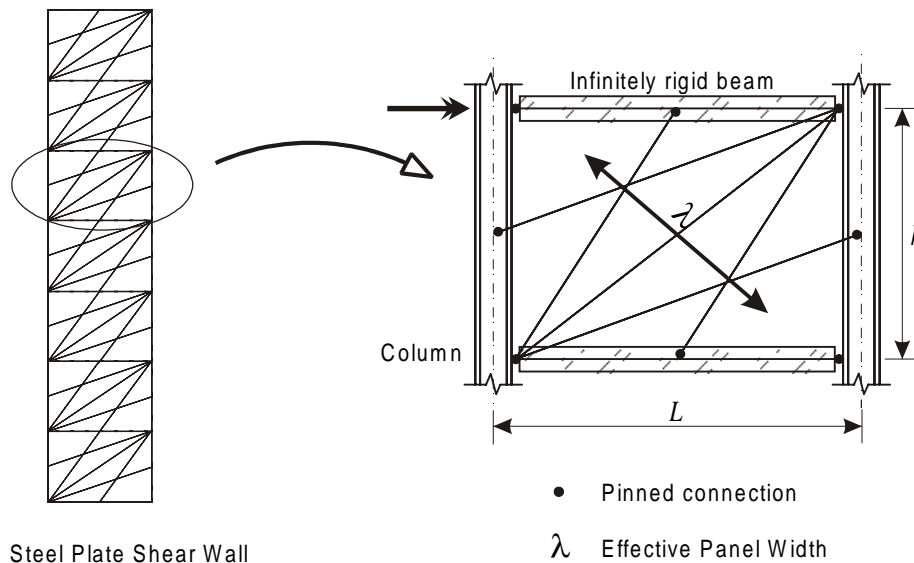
Proposed multi-angle strip model representation of a typical steel plate shear wall panel
